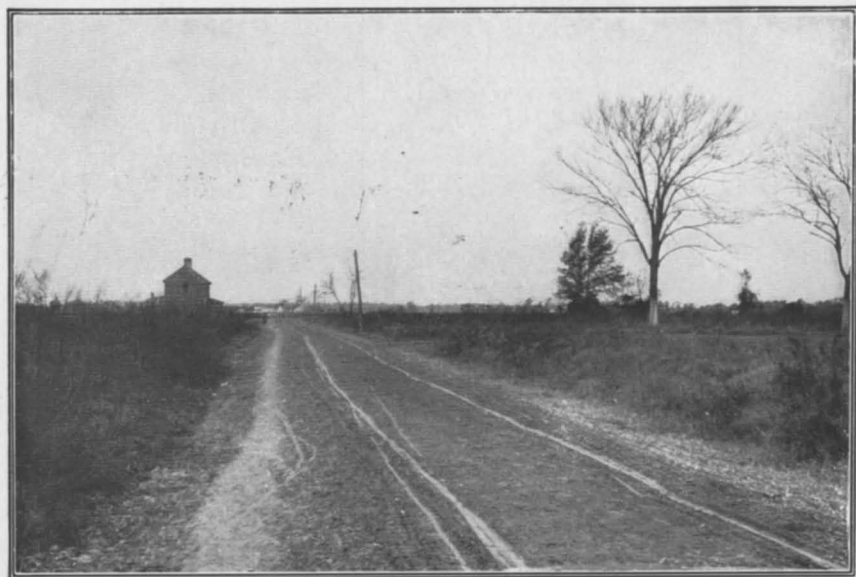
SAND-CLAY ROAD BUILT AT NEWBERN, N. C., UNDER THE DIRECTION OF THE OFFICE OF PUBLIC ROAD INQUIRIES.
